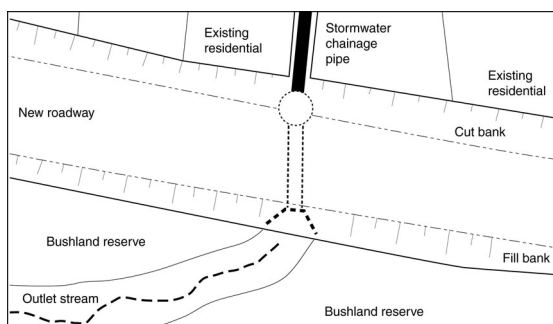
Stage 1: Major stormwater pipe extended across proposed roadway
